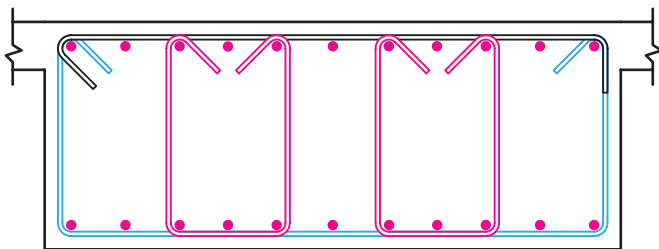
An alternate configuration consisting of a single U-stirrup (with 135-degree hooks) across the net width of the beam, two identical U-stirrups (each with 135-degree hooks) distributed across the beam interior, and a stirrup cap
